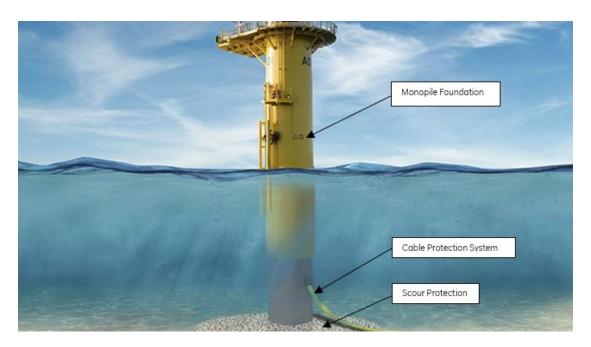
Example of cable protection system for a monopile foundation (Source: www.trelleborg.com)
